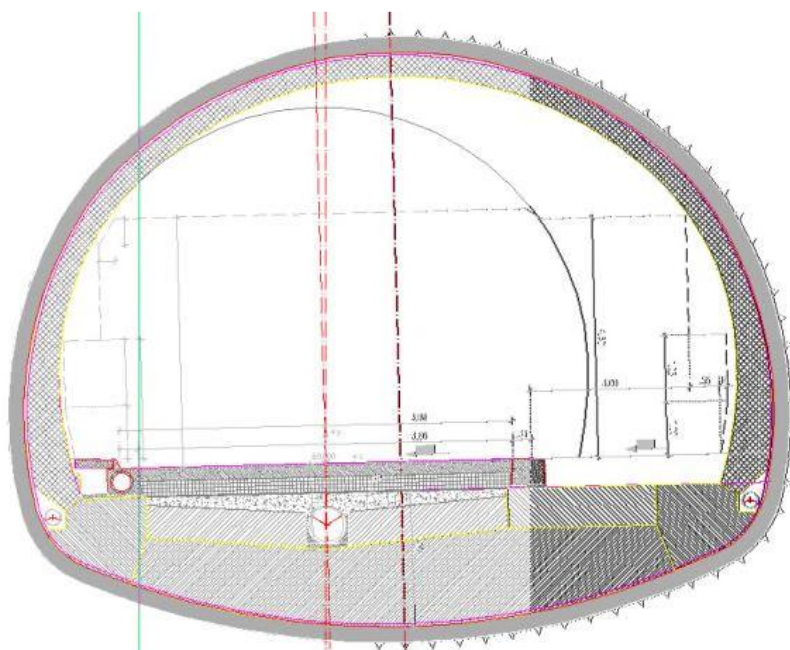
Cross section of the of the Prenj Tunnel main tubes at the location of parking niche
